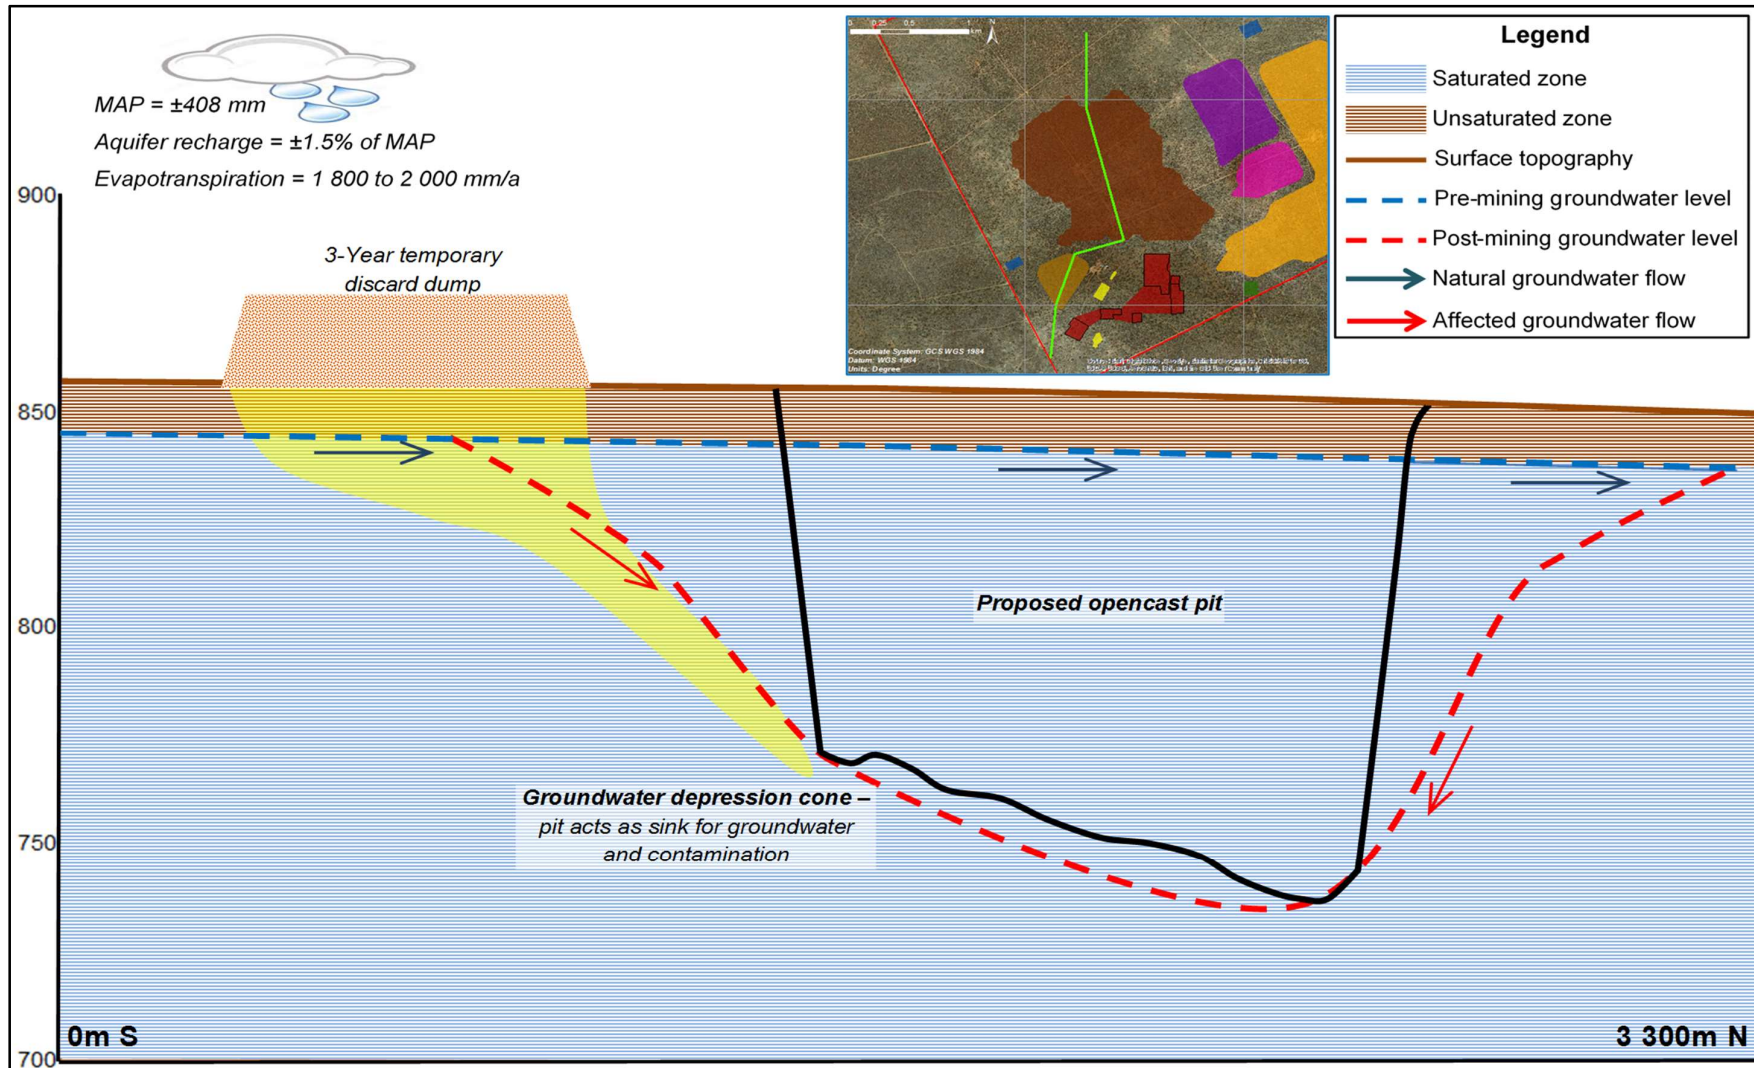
Vertical cross section from south to north through the proposed opencast pit
